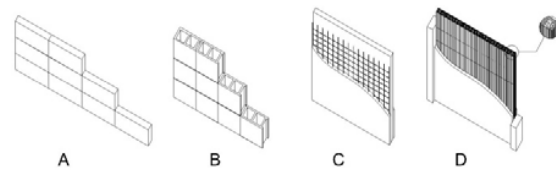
View of the four wall technologies; (a) autoclaved aerated concrete block (AAC Block), (b) concrete masonry unit (CMU), (c) 3D sandwich panel wall, and (d) pressed reeds panel
